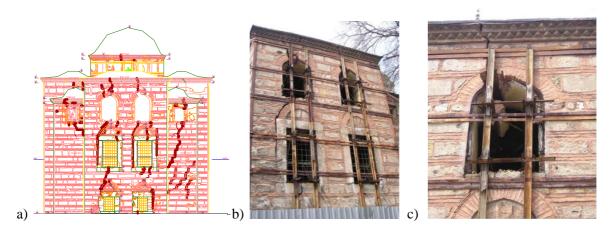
Damage patterns are seen at the a,b) South-East Façade c) Detail of a window
